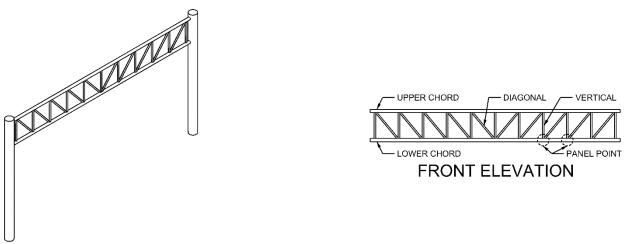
Overhead Span Traffic Signal Structure, Two Chord Plane Truss
